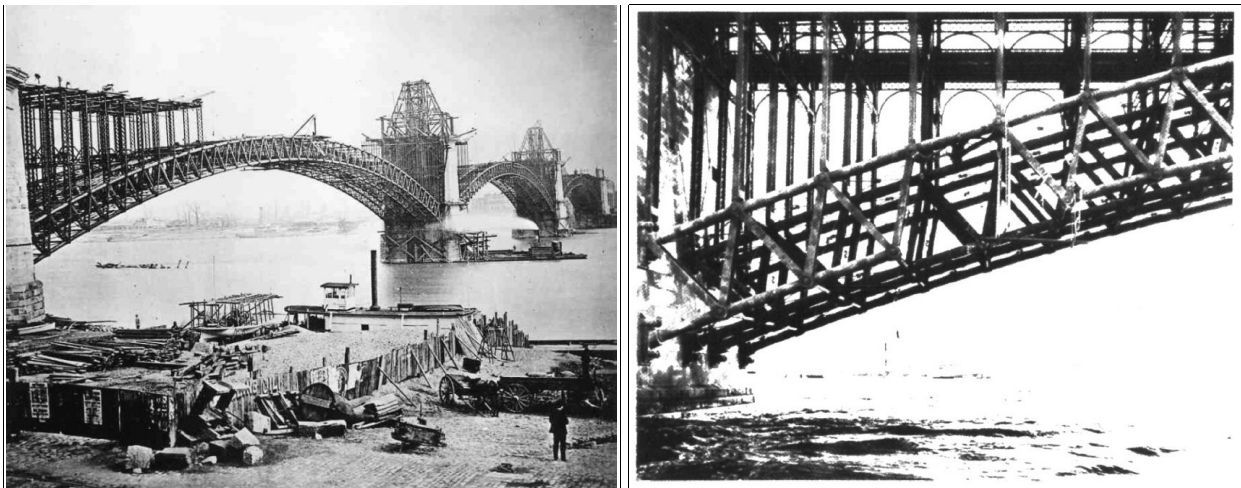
The Eads Bridge during construction and detail of the Damage it suffered in 1969. (Sources: Wikipedia, [4]).
